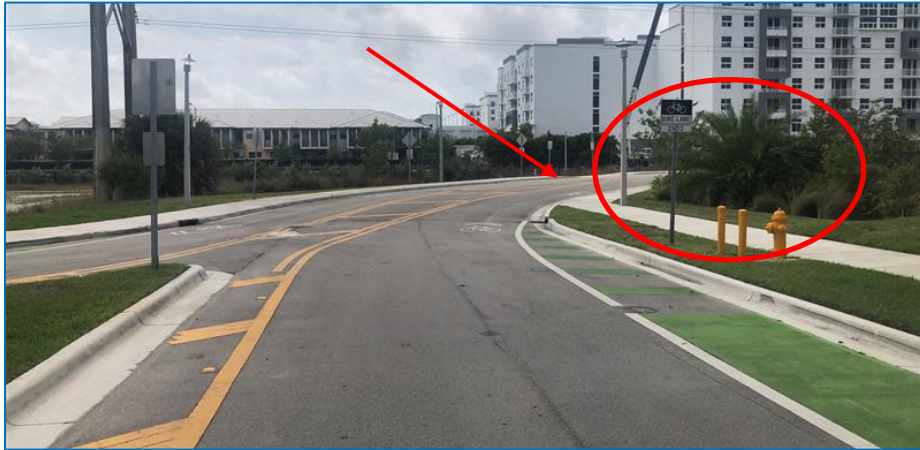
Sight distance restriction for southbound approach to Limestone Trail crossing
